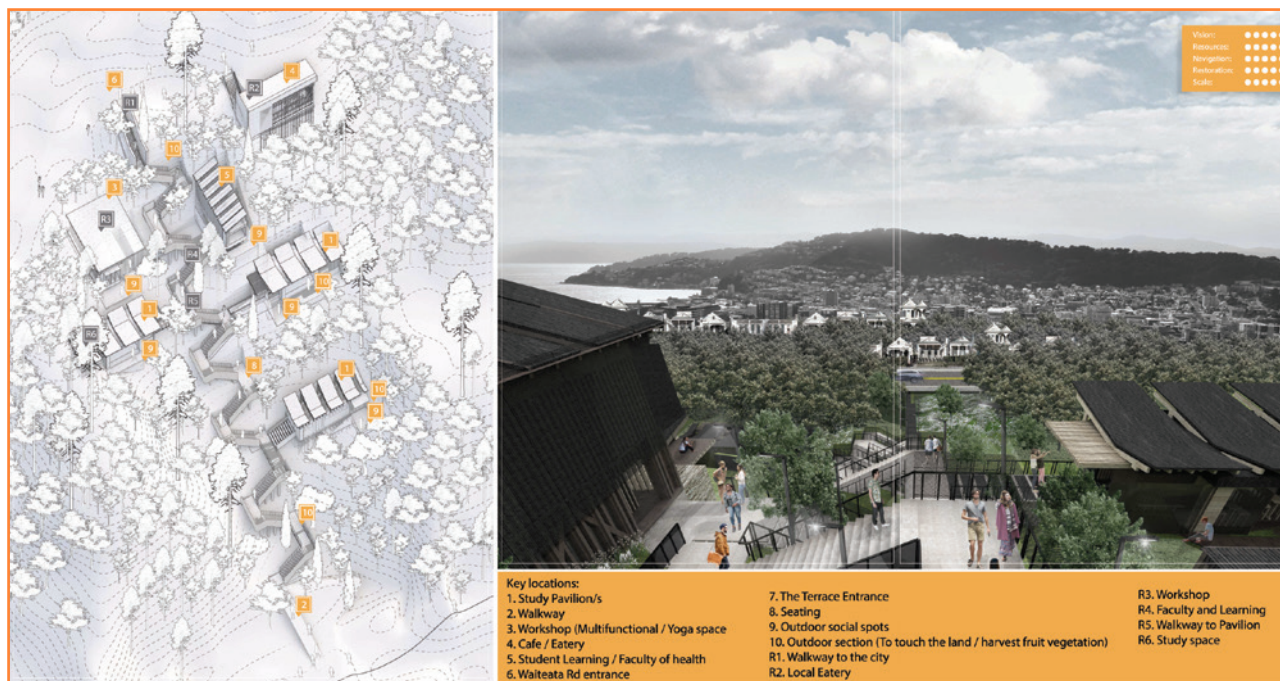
Final design proposal for Waiteata Road and view towards Wellington downtown
